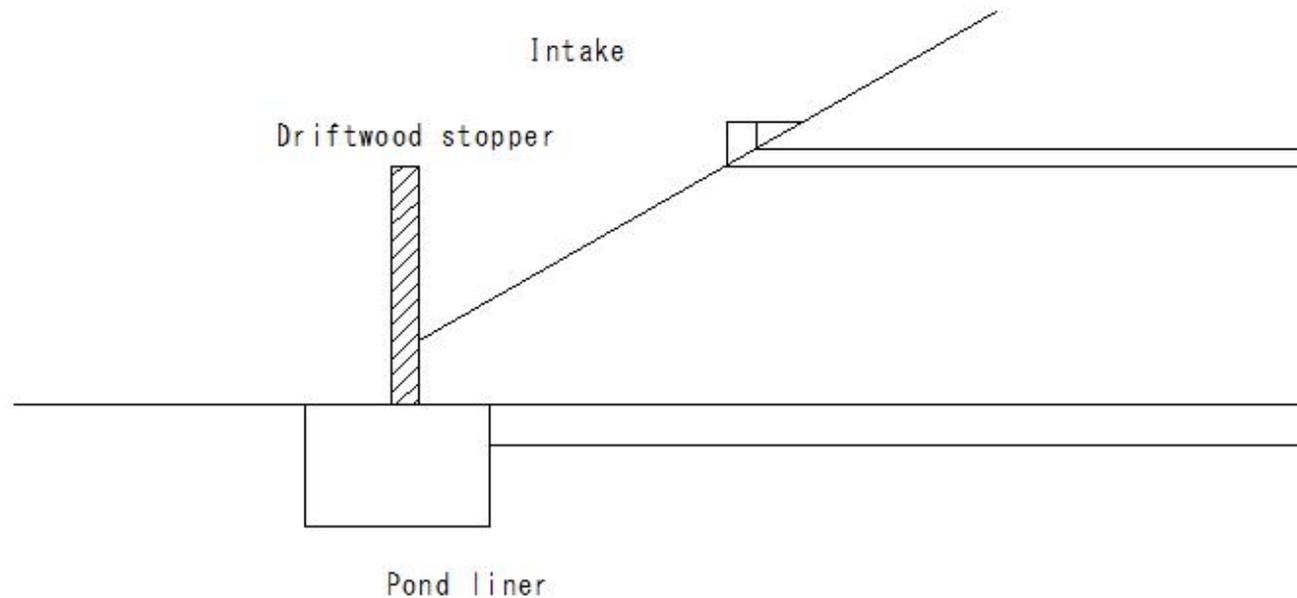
Example of a driftwood stopper installed on the upstream side of the culvert
